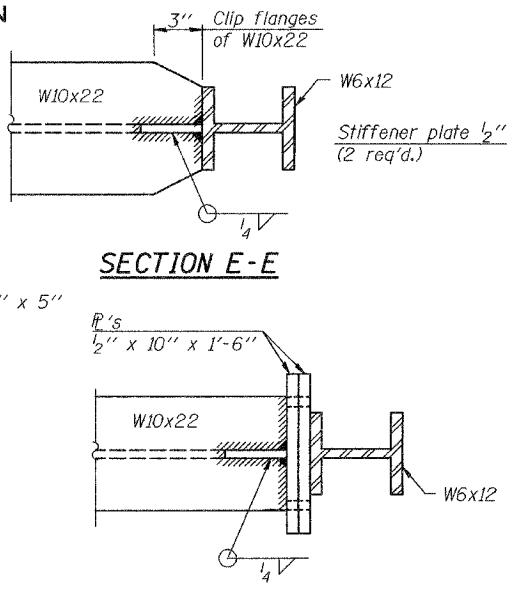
DETAIL B - WELDED W10x22 TO W6x12 CONNECTION
